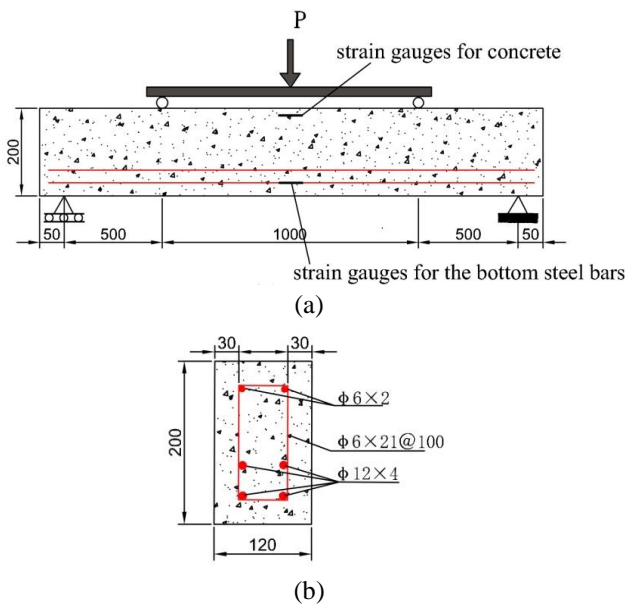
(a) Details of beam geometry; (b) arrangement of reinforcements (mm)
